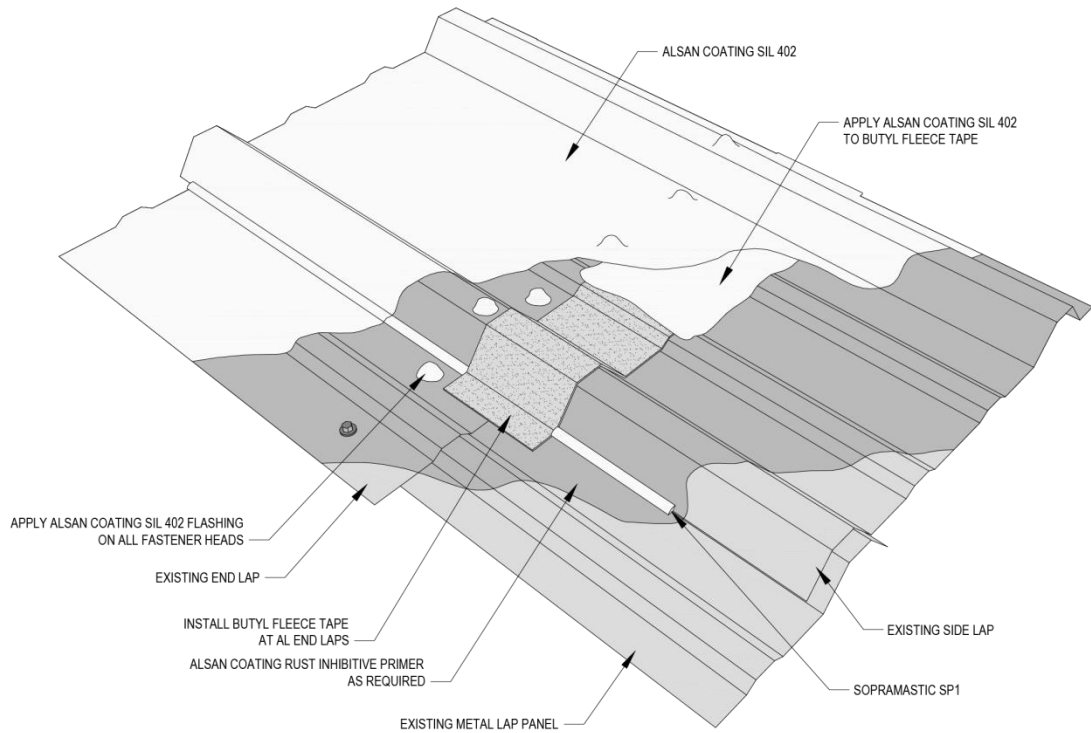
Silicone Roof Coating Over Metal Lap Panels, Side/End Laps
